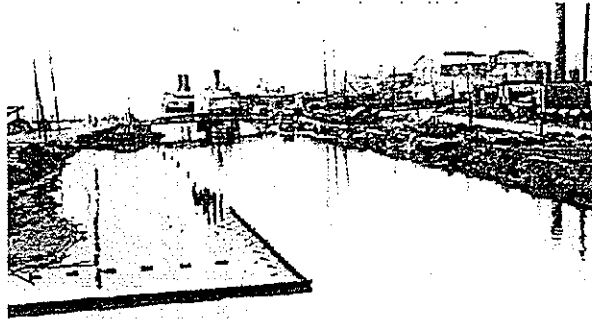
Concrete walls under construction on the Keating Channel at Cherry Street in 1914. The National Iron Works are in the right background.
